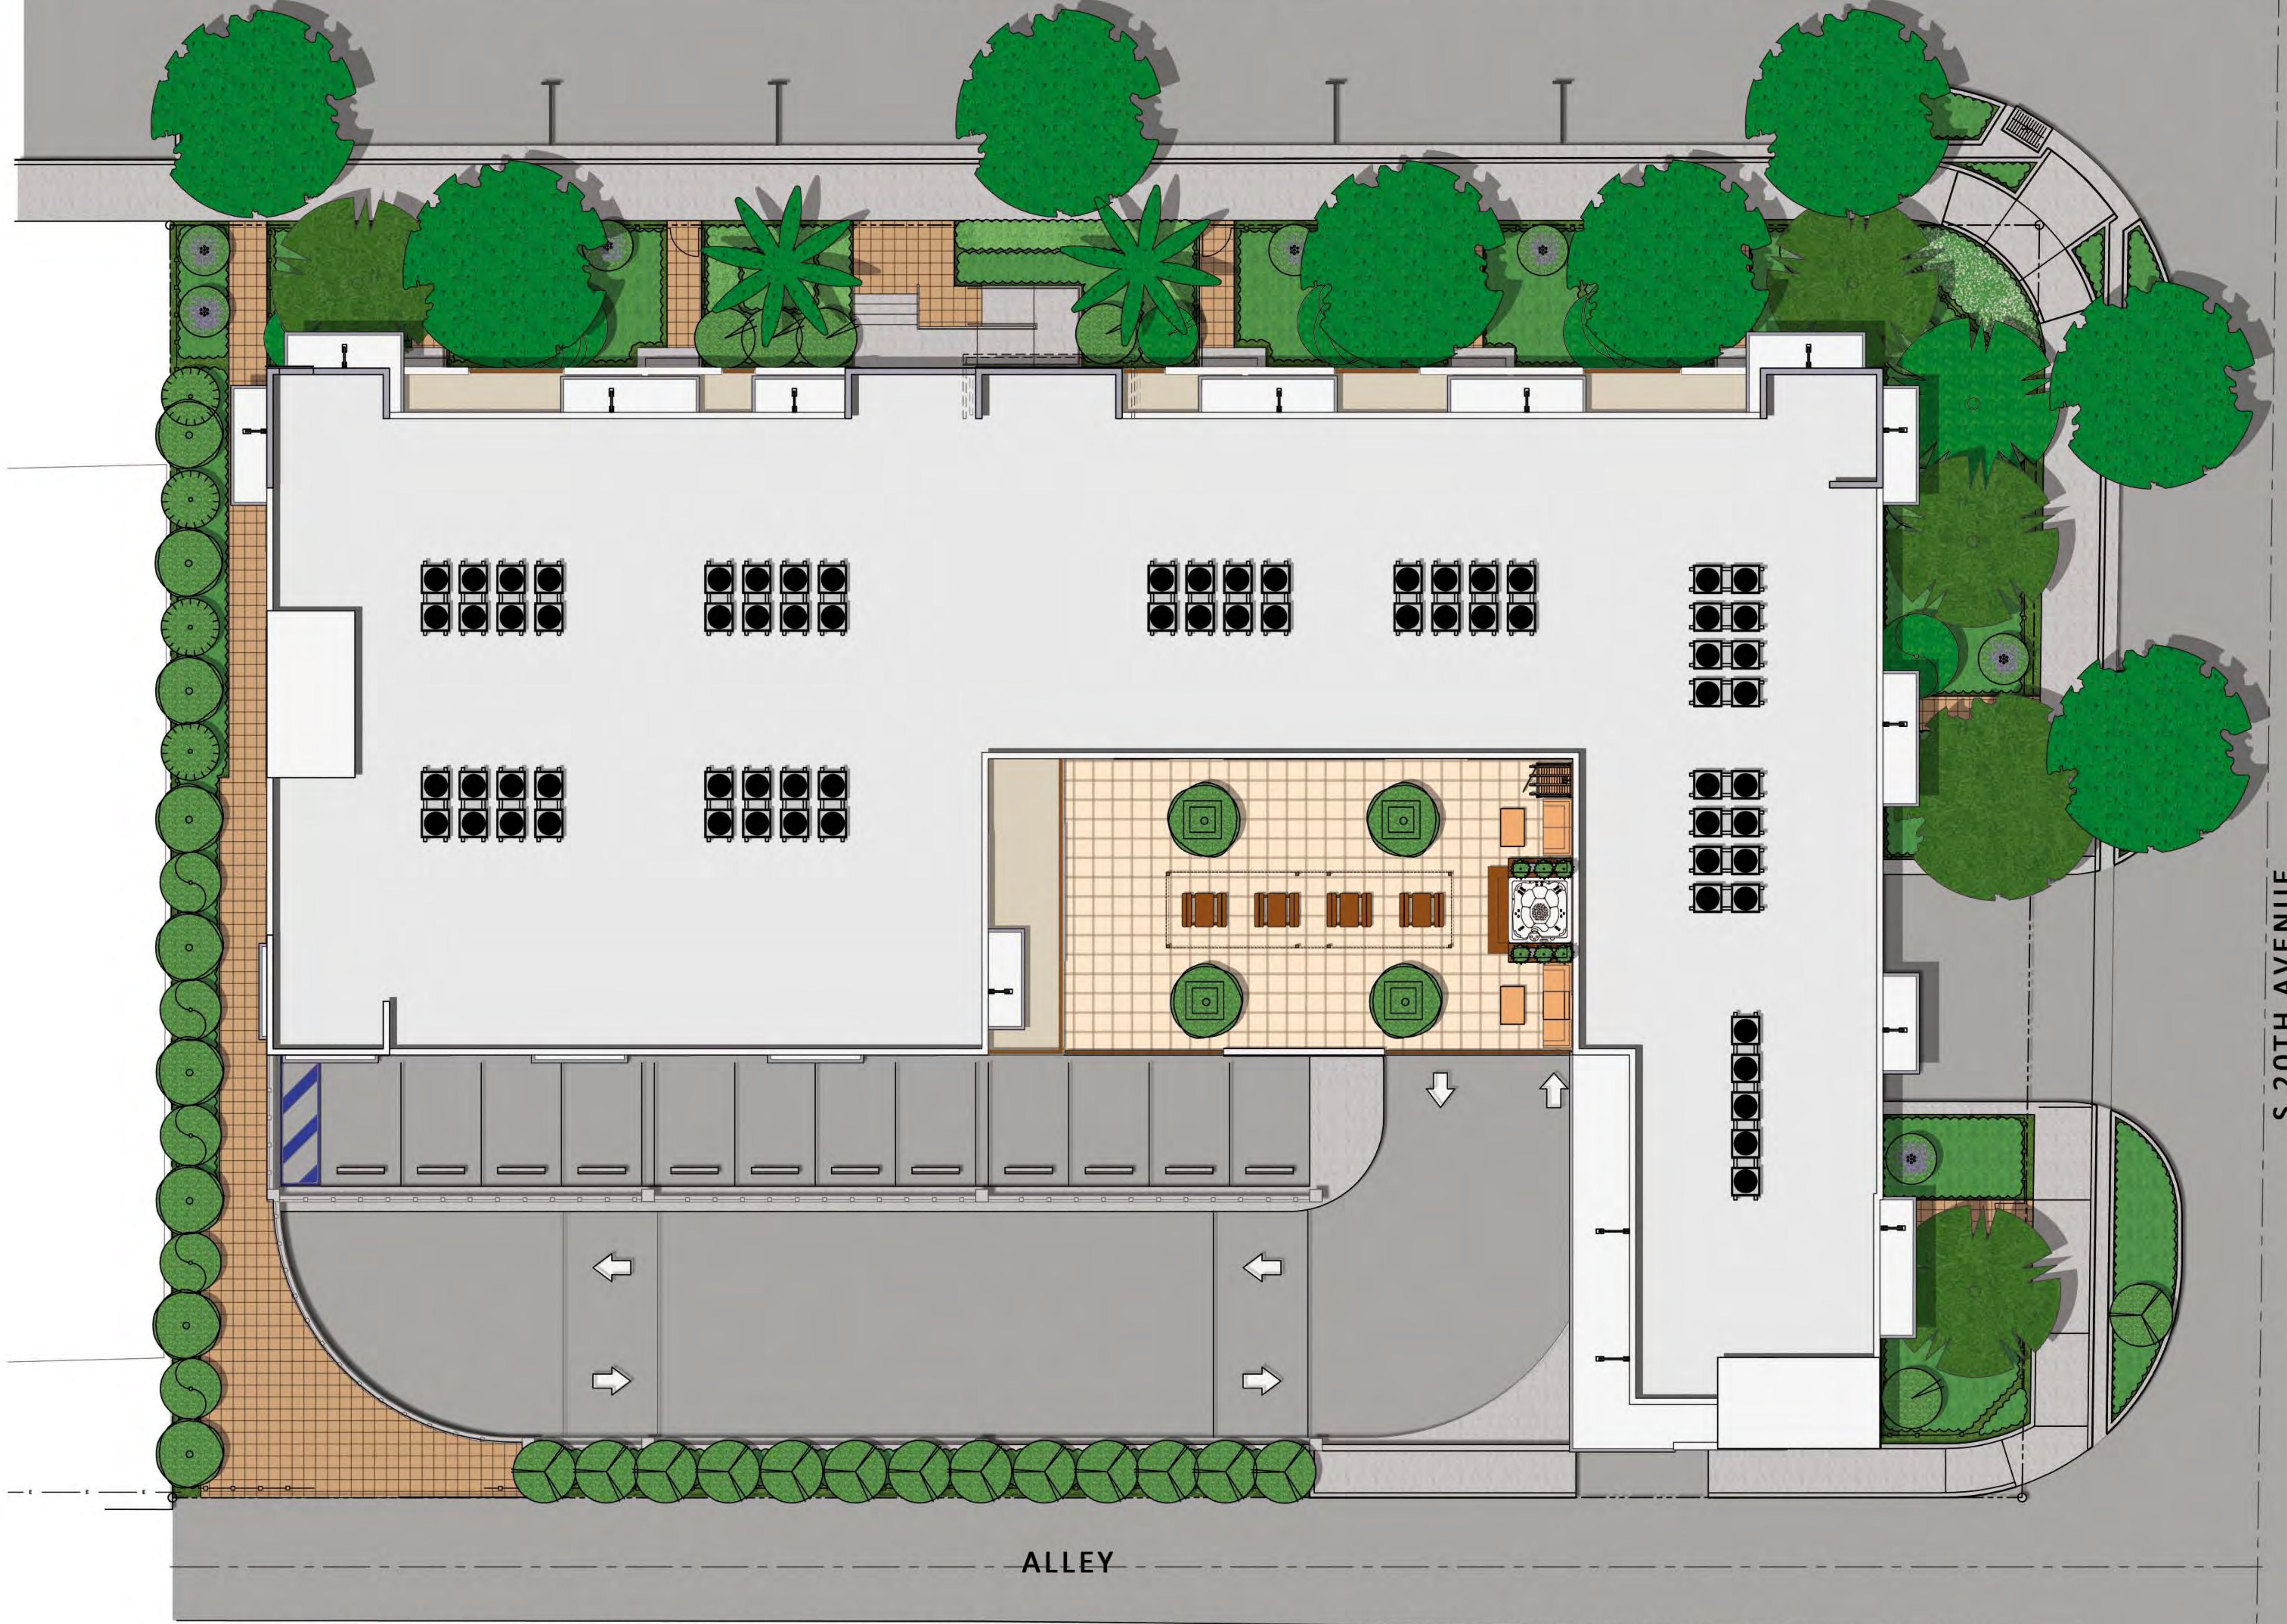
EXHIBIT "B" AMENDED DESIGN AND SITE PLAN
